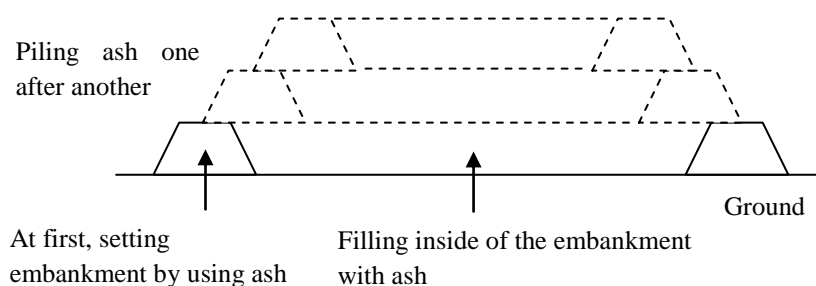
Rough Cross-Section of New Ash Disposal Area
